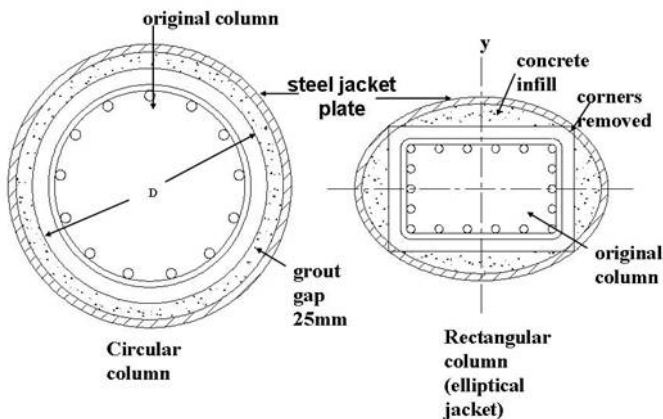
CONFINEMENT OF COLUMNS BY STEEL JACKETING
